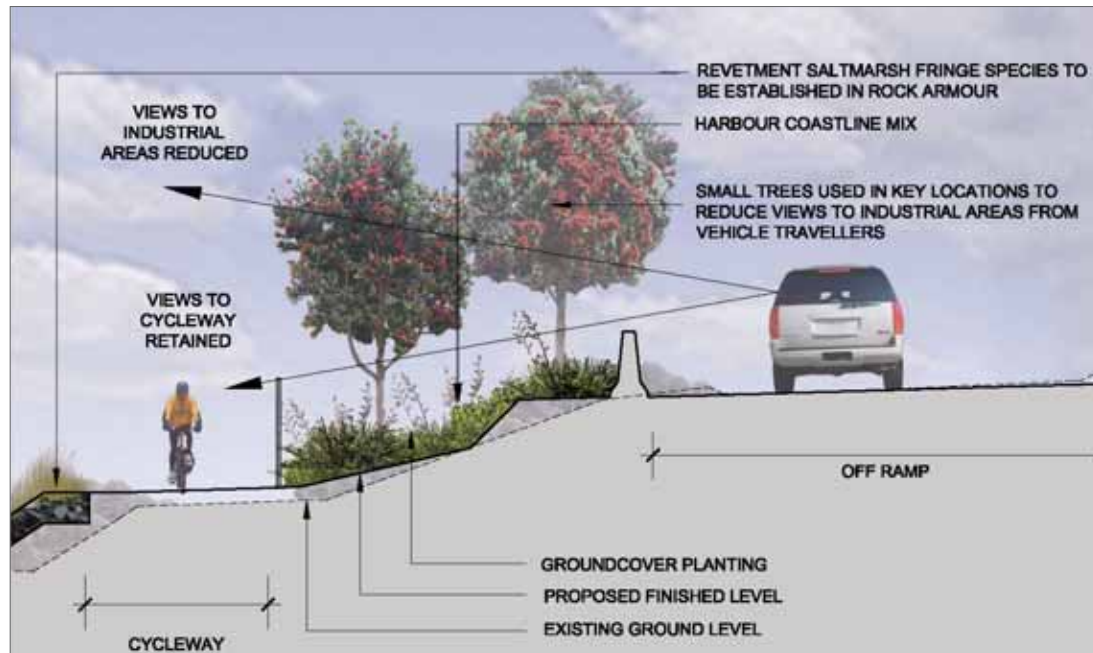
Enlargement of future cross section at Rosebank off-ramp (section C)
